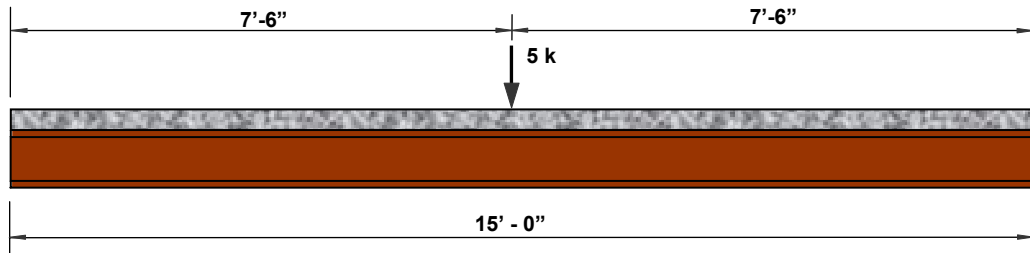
Plan view of the Newmark bridge showing longitudinal dimensions and loading
